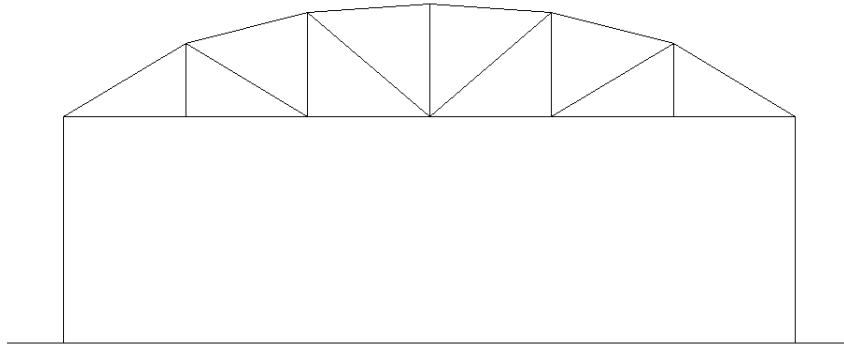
Another Modified Wood Truss Configuration with Top Chord Separated Into 6 Members
